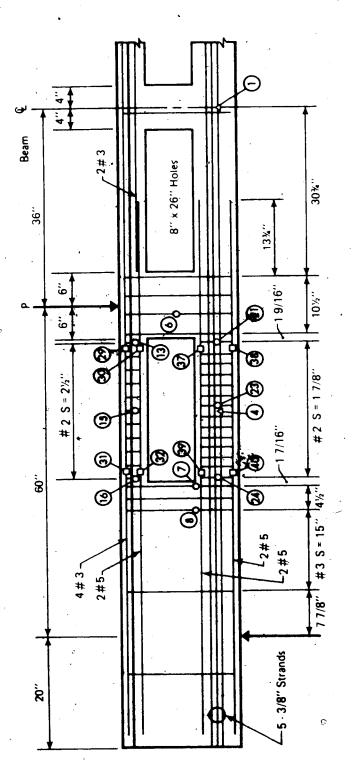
Reinforcepent Details and Strain Gage Locations for Beam 21-26-5
